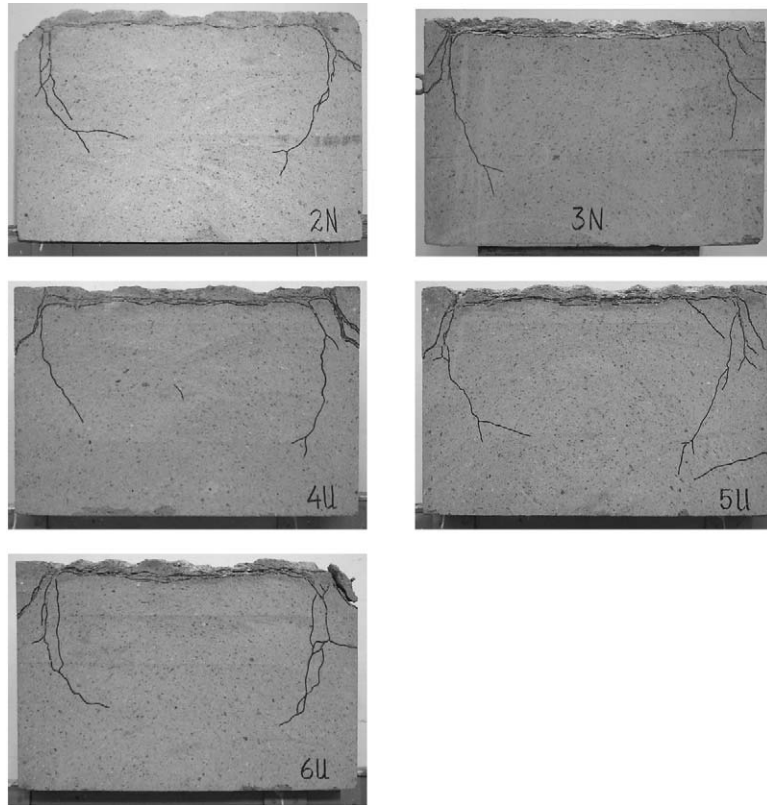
Macro-crack patterns in the cross section of concrete blocks (after cutting into halves).
